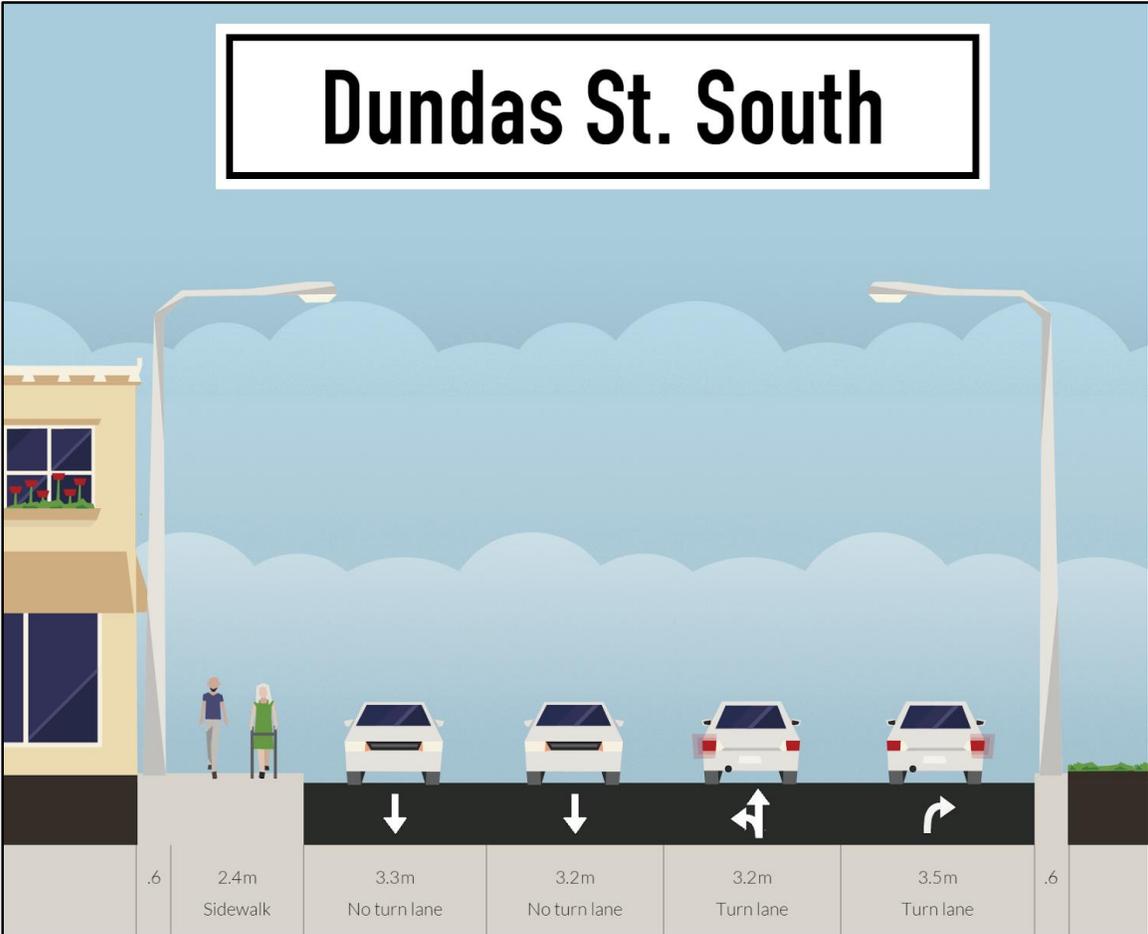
Cross section of the proposed Dundas St. (South side) modifications (Figure 4(3)).
